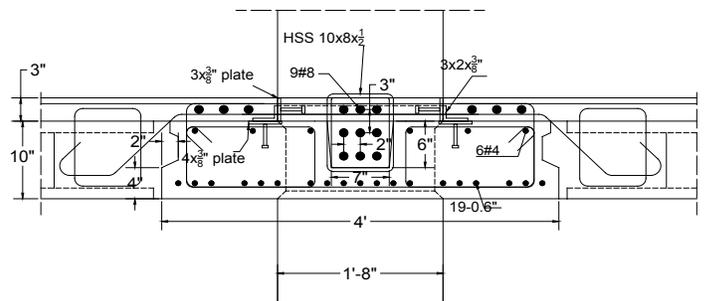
Column, Beam, and Hollow Core Connection (ft = 0.3048m)
